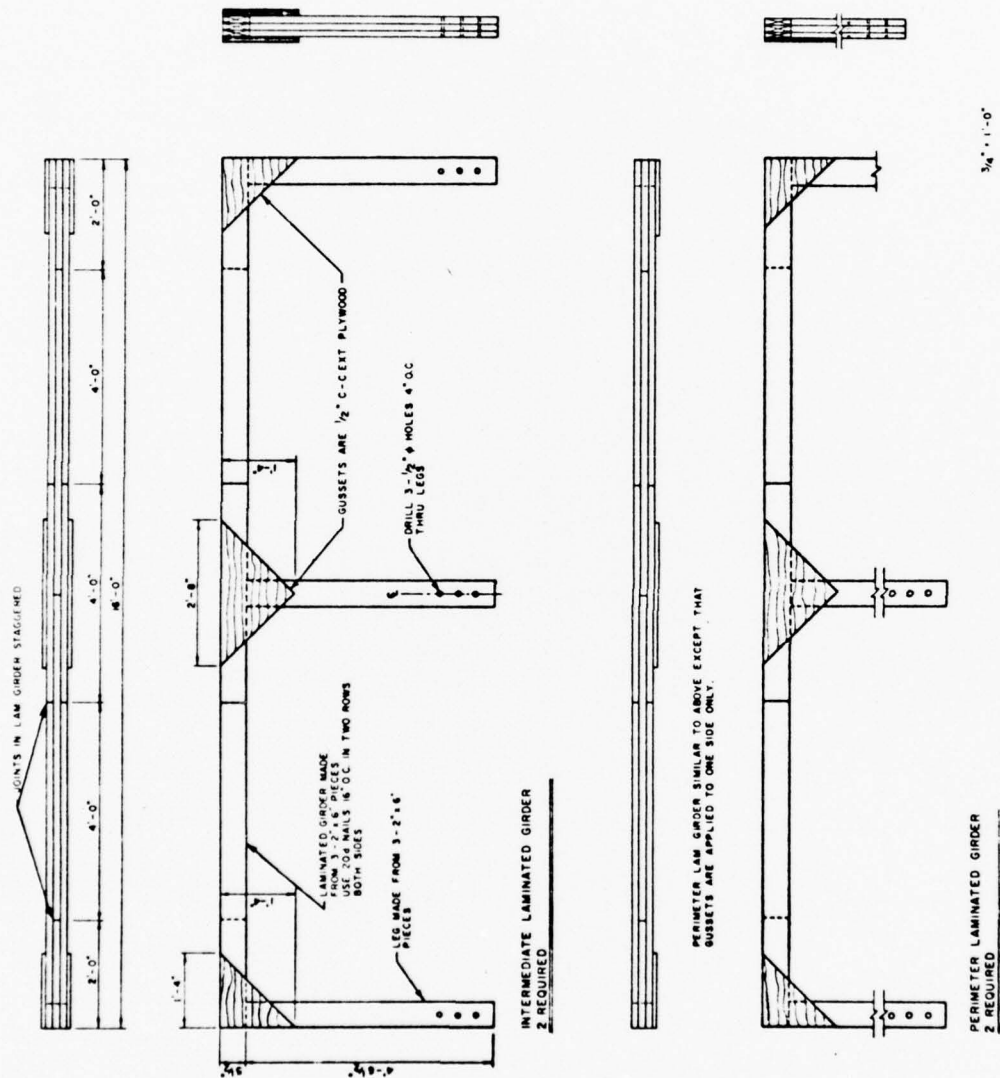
Foundation "laminated-girder" design. SI conversion factors:
